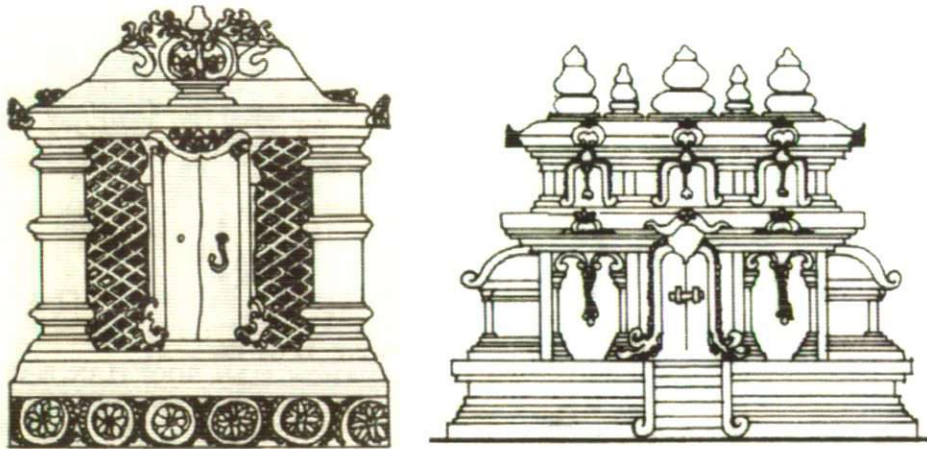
, 8th century, two elevation drawings of temples facade in Borobudur, Central Java. Drawing by Parmono Atmanti
